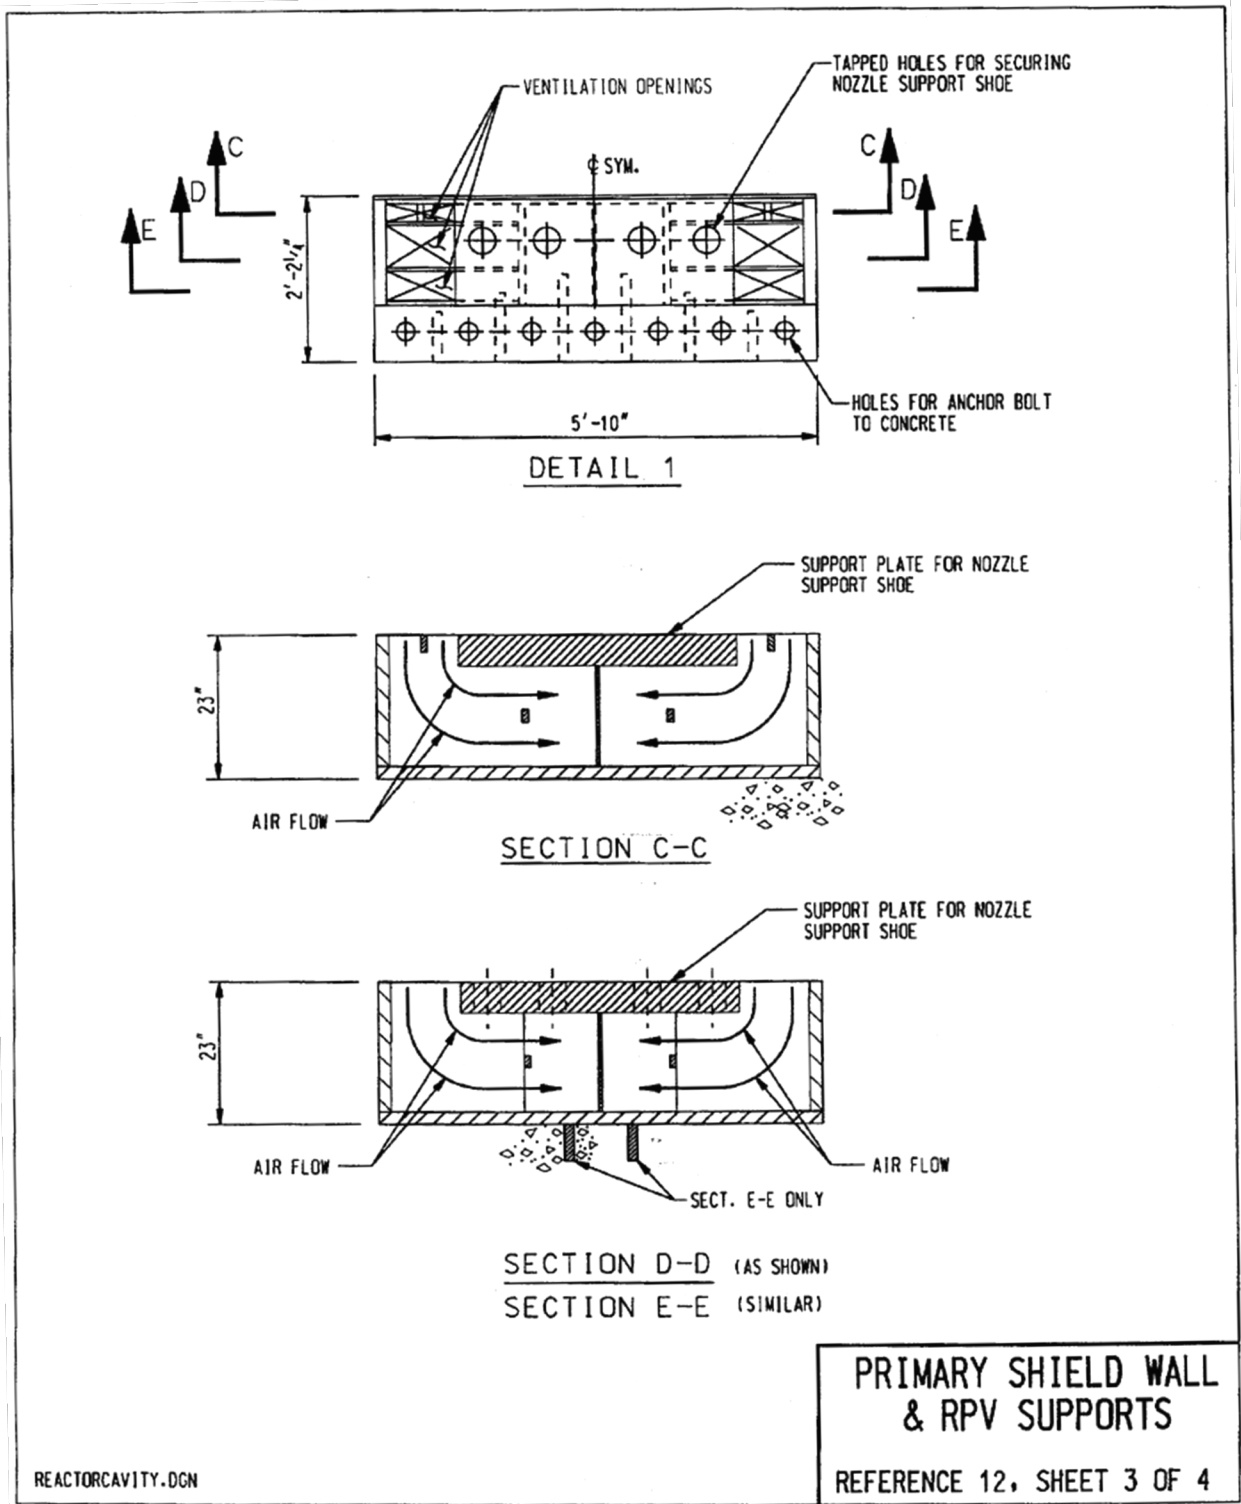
Farley Units 1 and 2 Reactor Vessel Support Box Detail [166]
